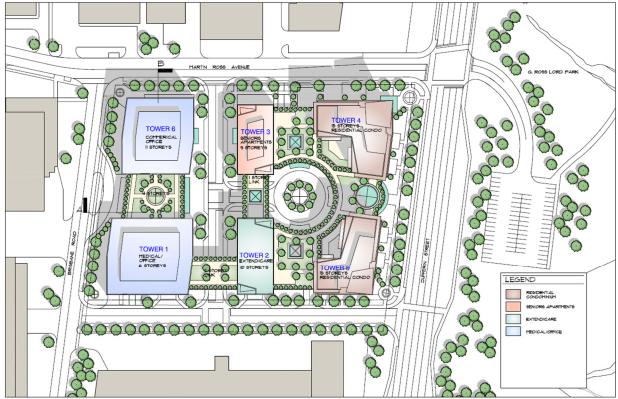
Proposed Mixed Use Redevelopment of 4646 Dufferin Street
